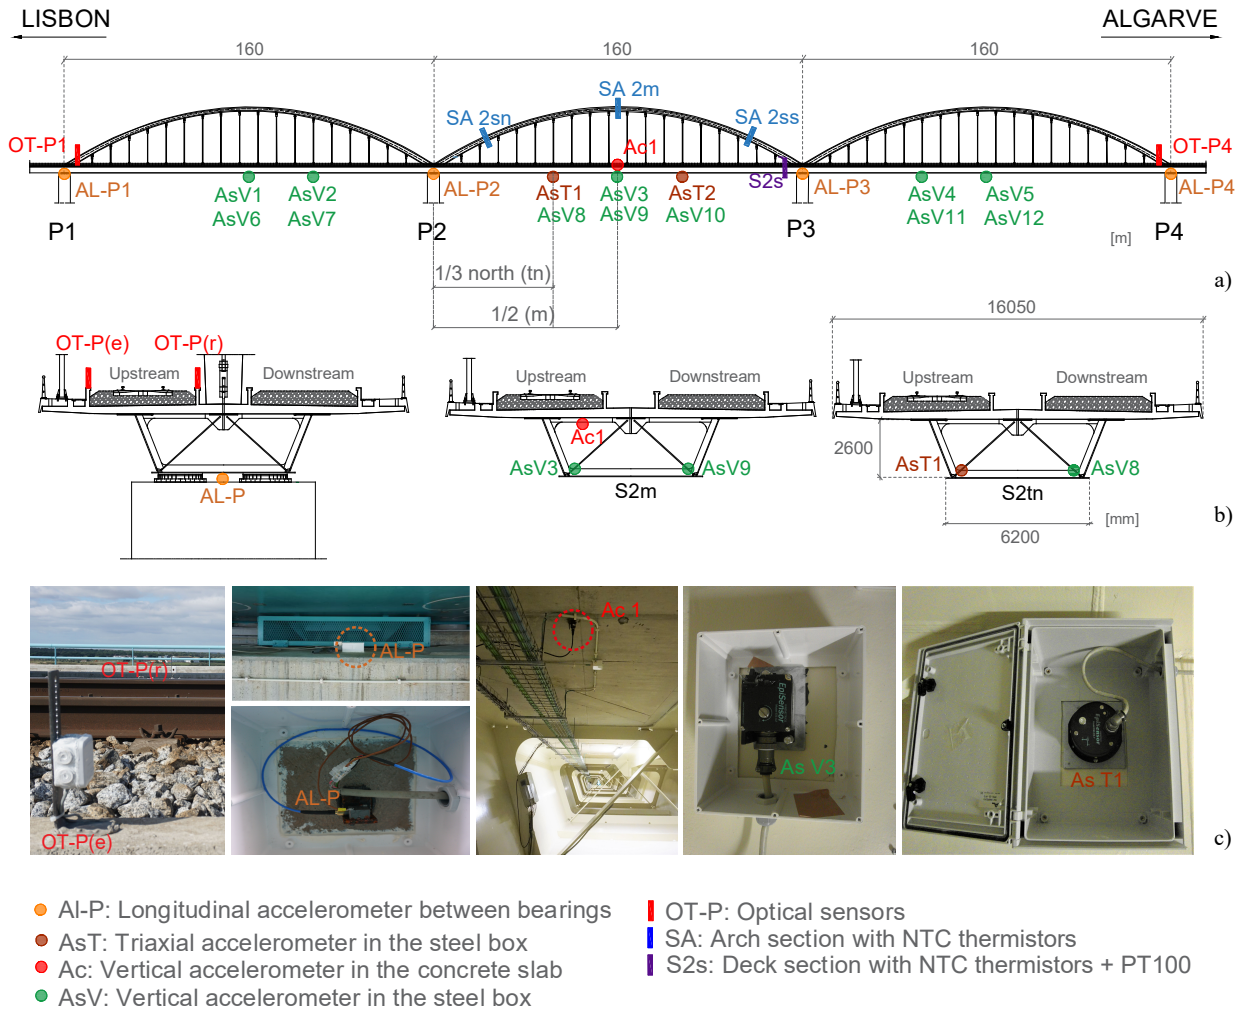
SHM system installed in the Sado railway bridge: a) overview, b) cross-section of the deck with the sensors location, c) photographs of the sensors installed in situ.
